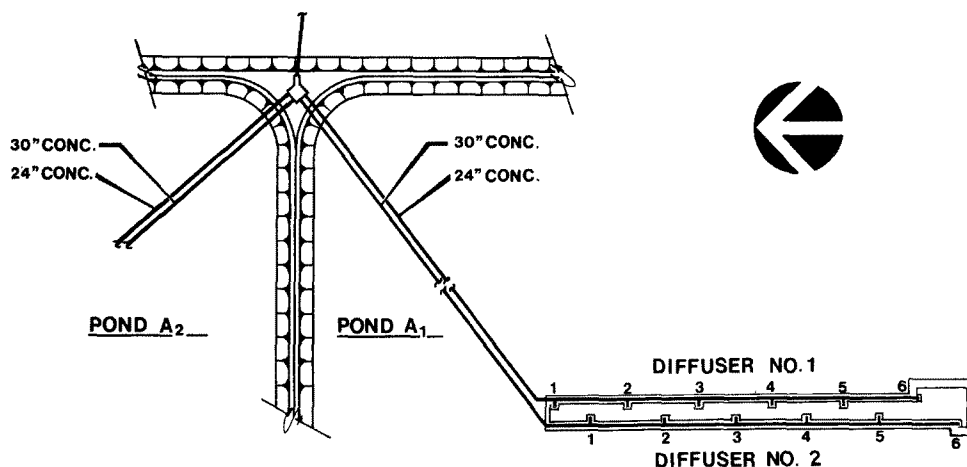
Diffuser and distribution box layout at the Logan wastewater stabilization ponds.
